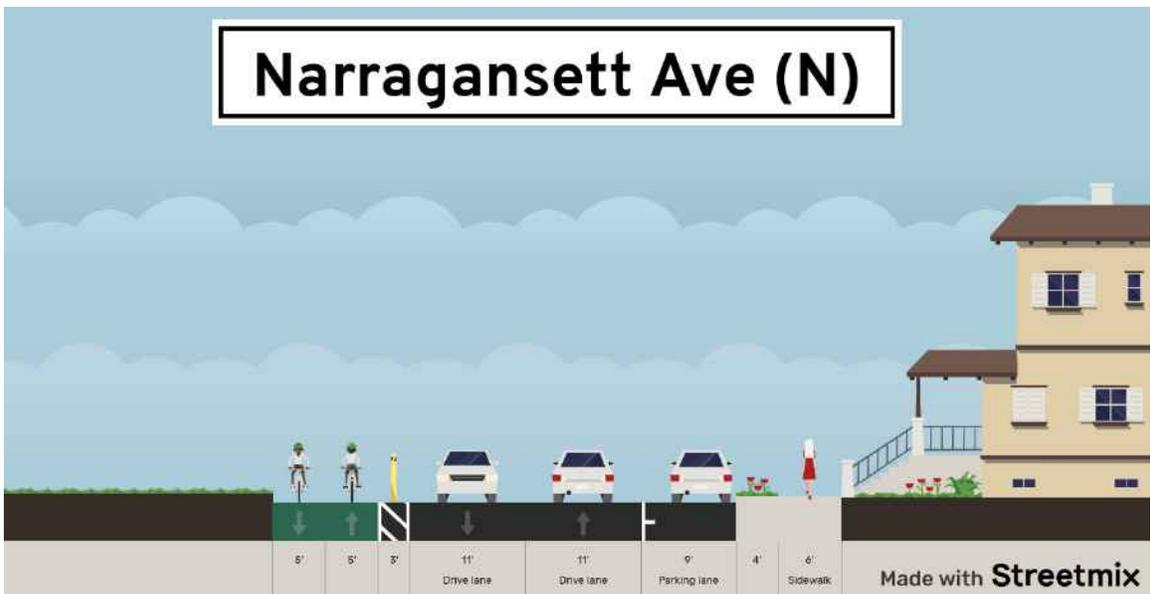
NARRAGANSETT AVENUE NORTH OF CASWELL STREET
